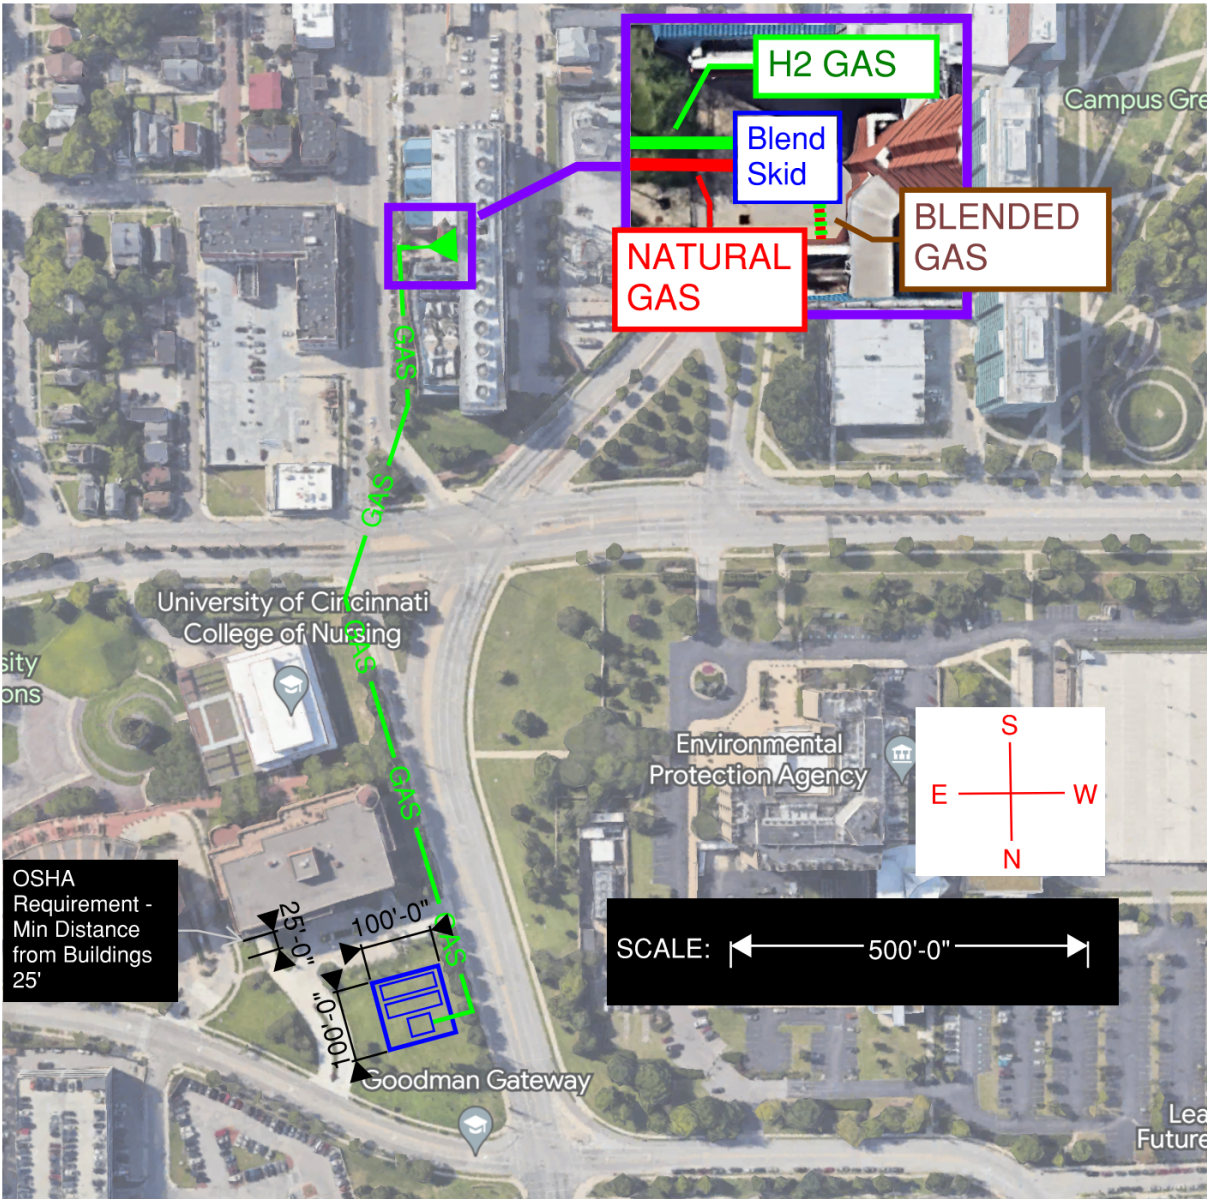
Proposed Hydrogen Storage and Blending Design (Drawing made in BlueBeam)
